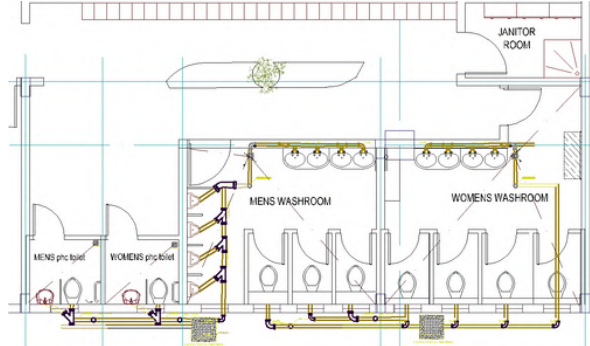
TOWER B BATHROOM PLUMBING LAYOUT
